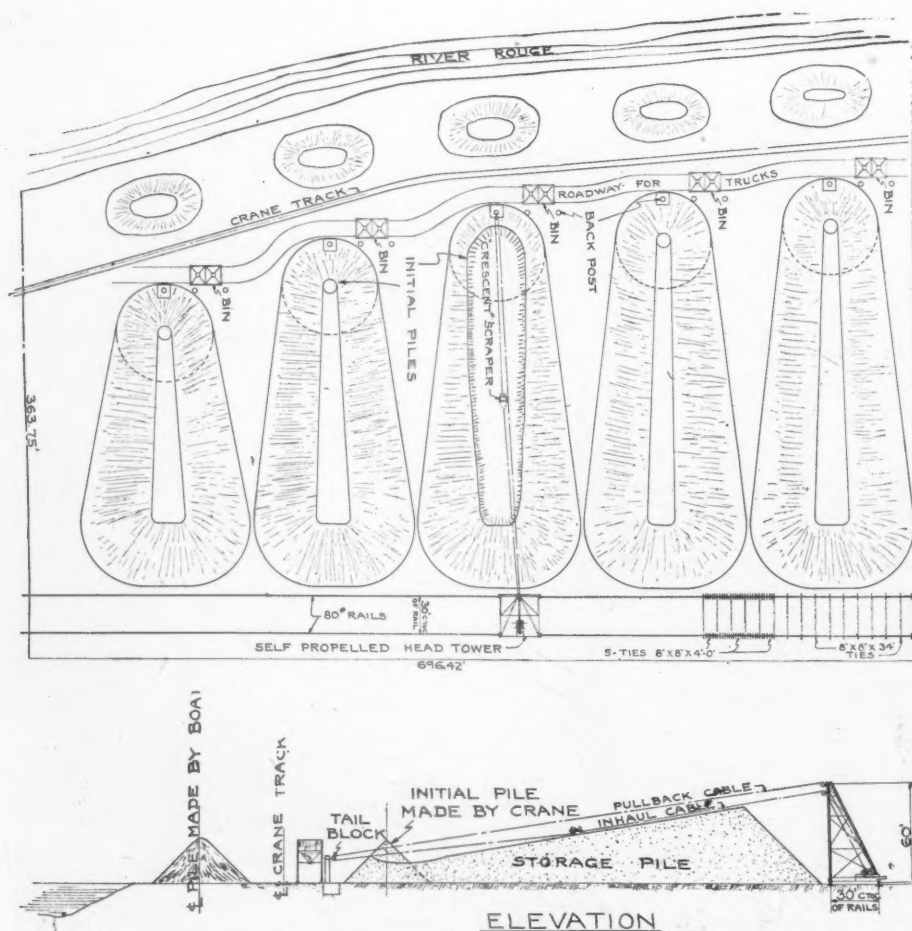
Plan and elevator of storage system at the Lake Sand and Gravel Co. plant on the River Rouge, Michigan
